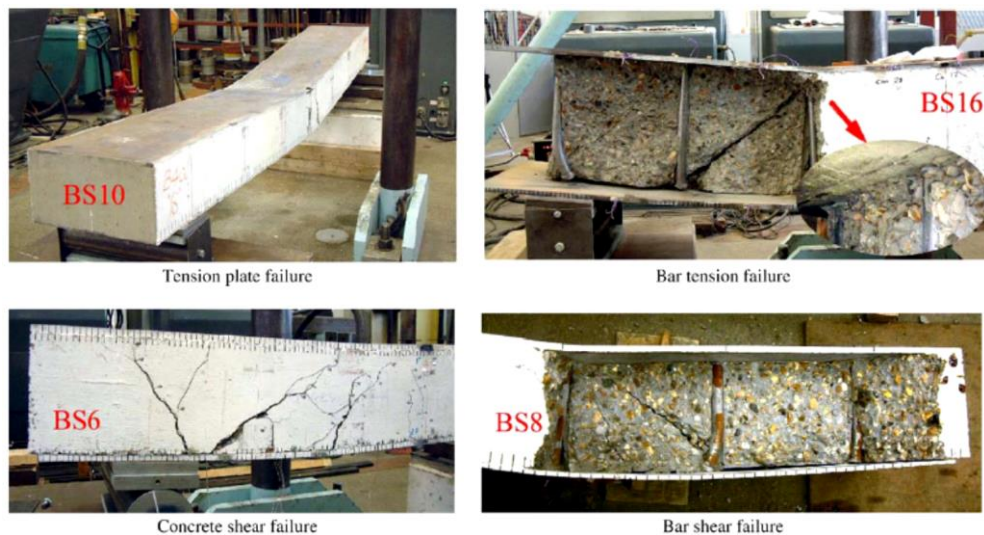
Beam failure modes under static load (Xie et al., 2007)
